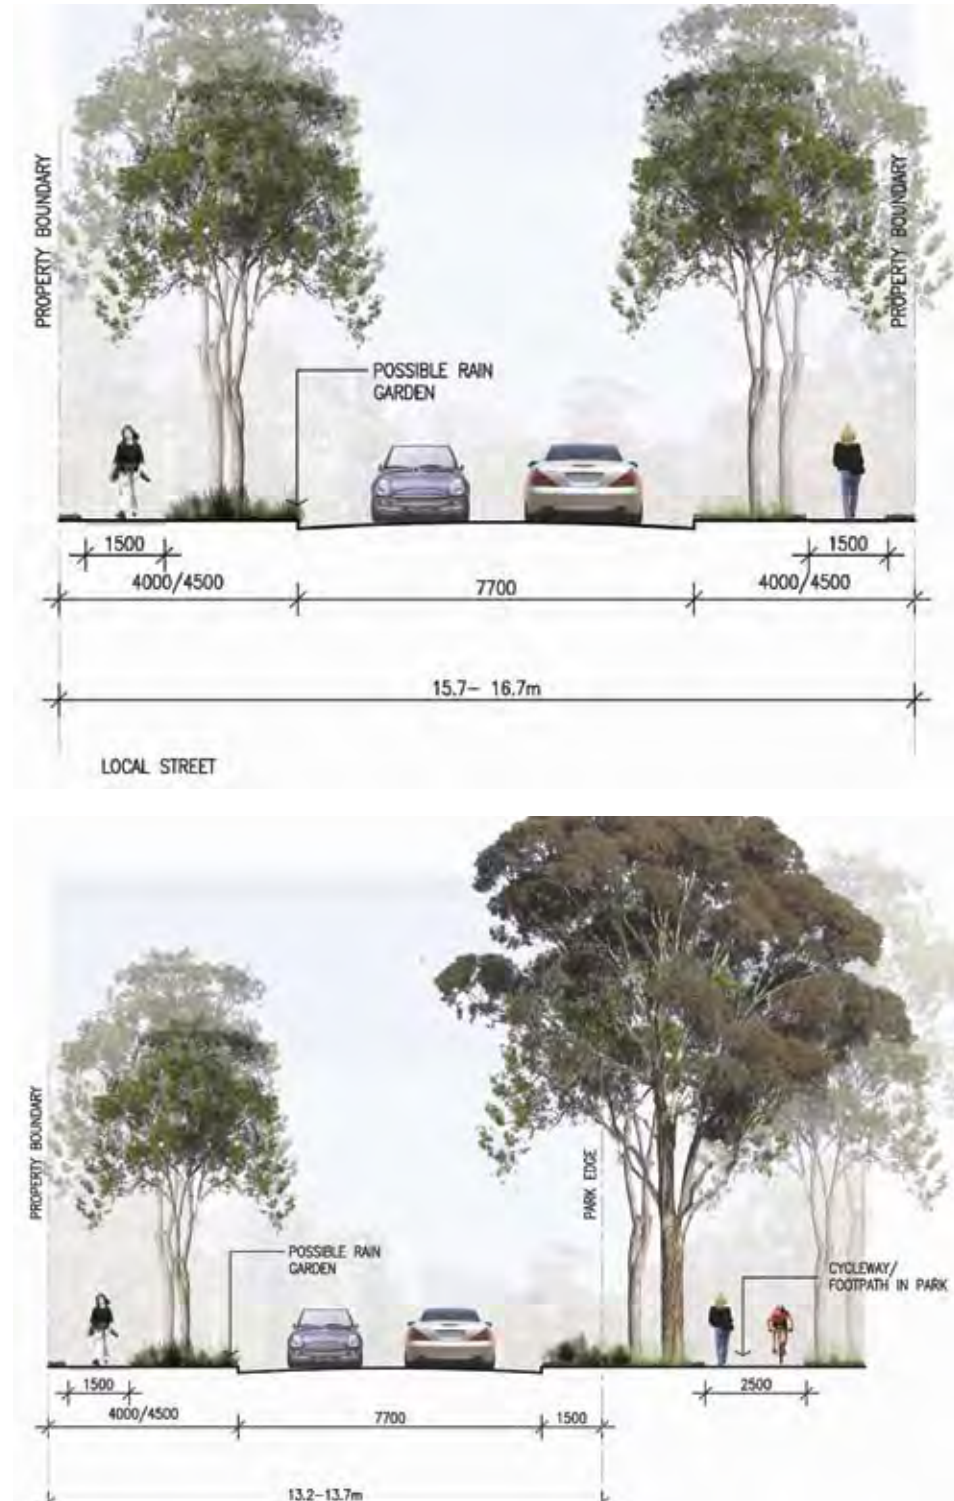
Stage 1 Residential Village - Road Carriageway and Reserve Widths
